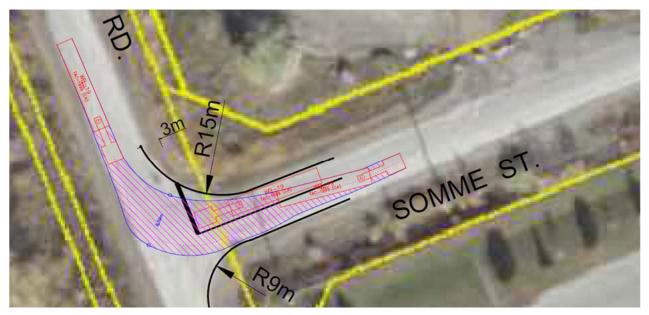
Existing Hawthorne Road/Somme Street Intersection Heavy Vehicle Swept Path
